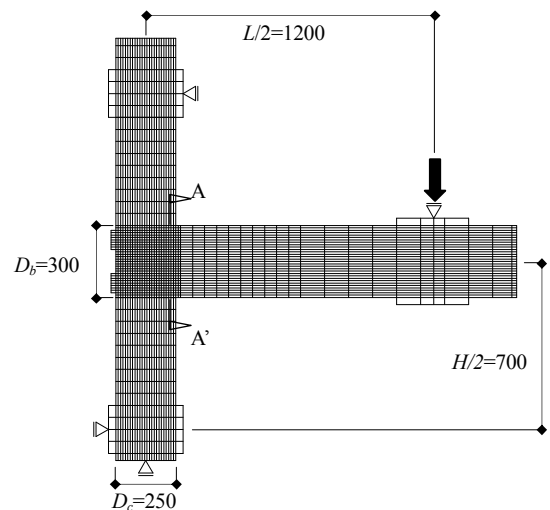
Outline of T-Shape Top Story Extriore Model(mm)
